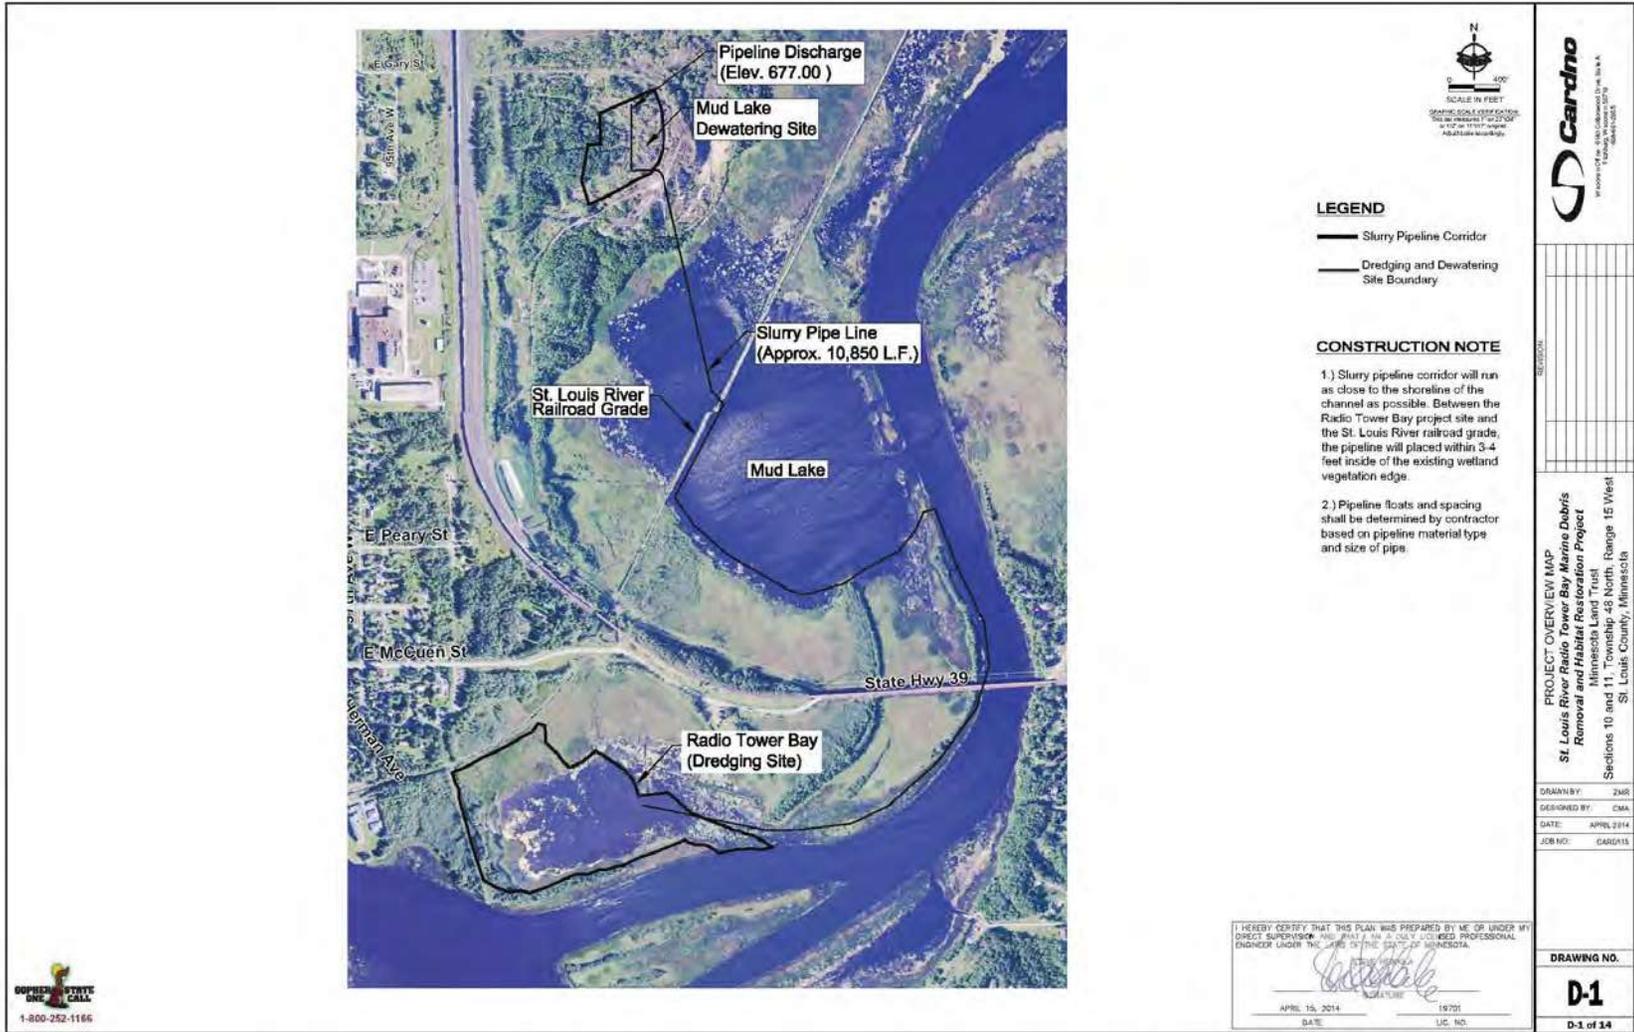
Construction Plan Sheet D-1: Project Overview Map.
